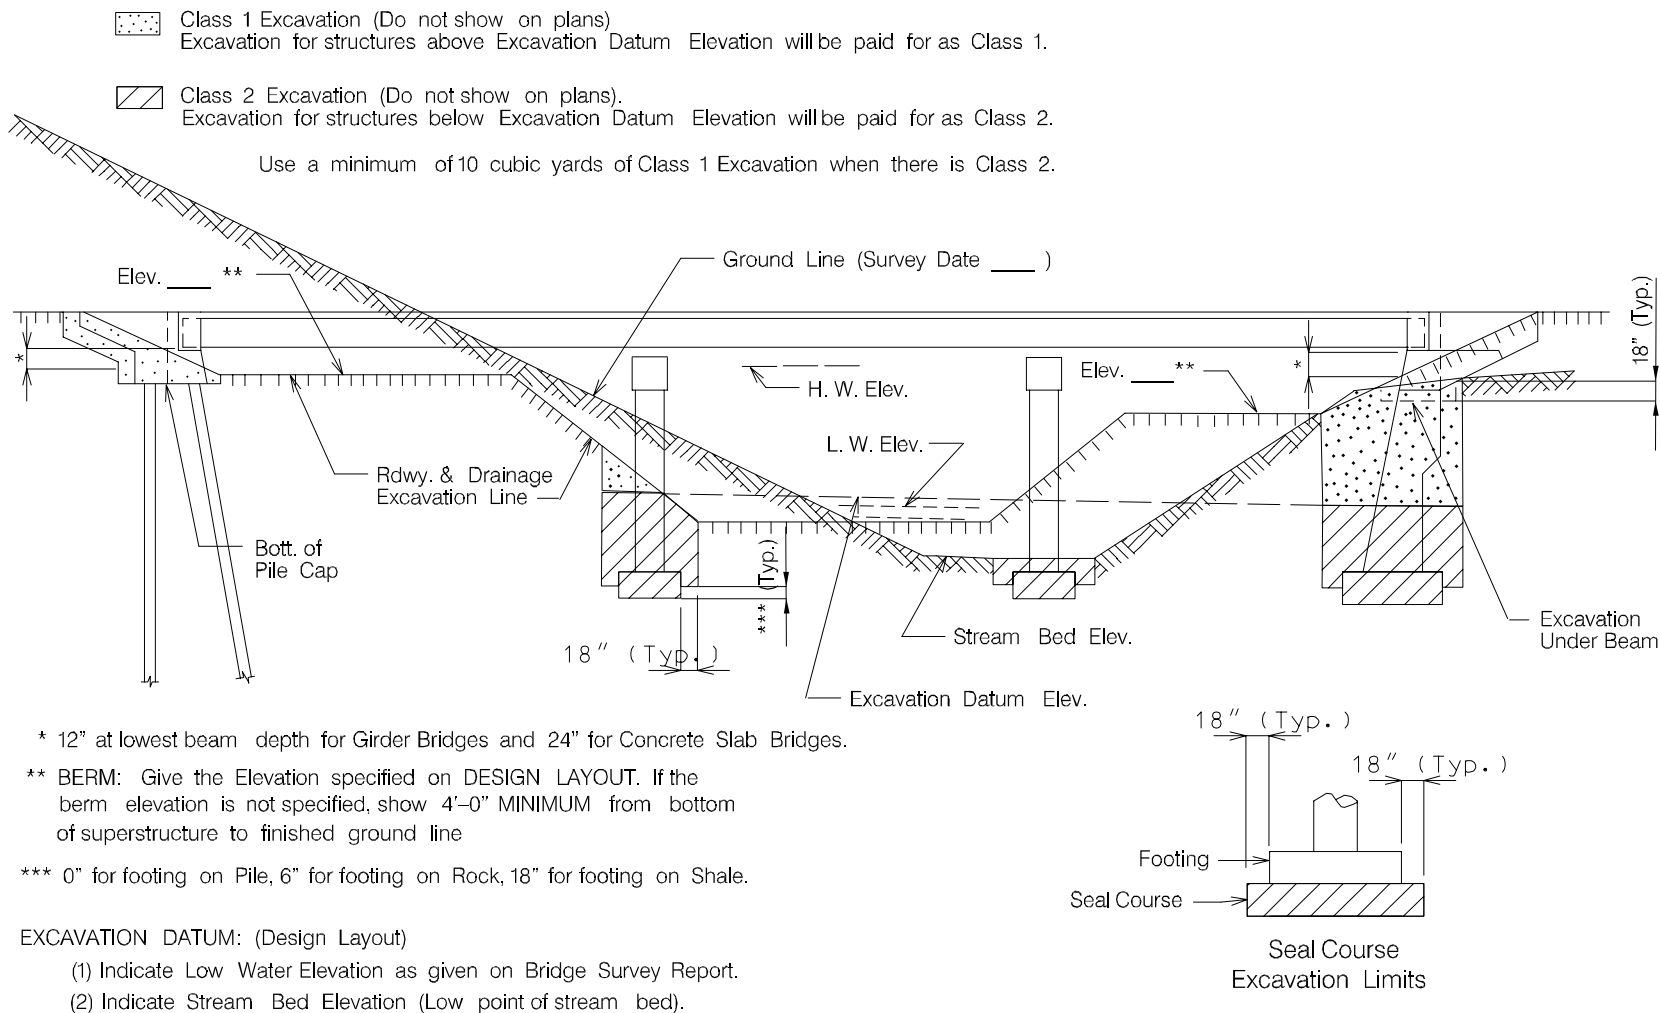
6 Excavation Limits: Stream Crossings (Typical)
